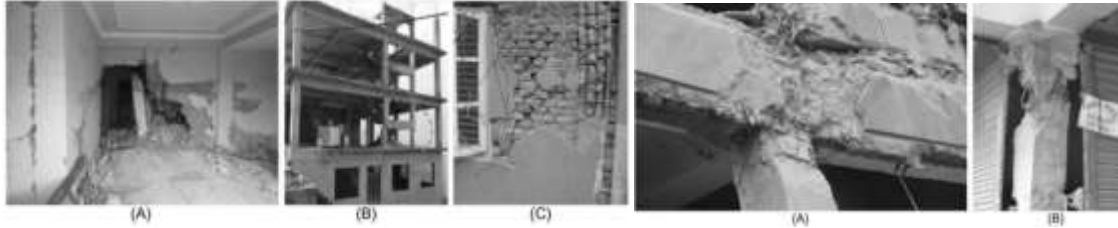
Examples of short column failure (A): Staircase landing (B): Staircase landing beam (C) (figure imported from Varum, H et.al) Figure 3b: Weak Beam-Column Joint Failure
